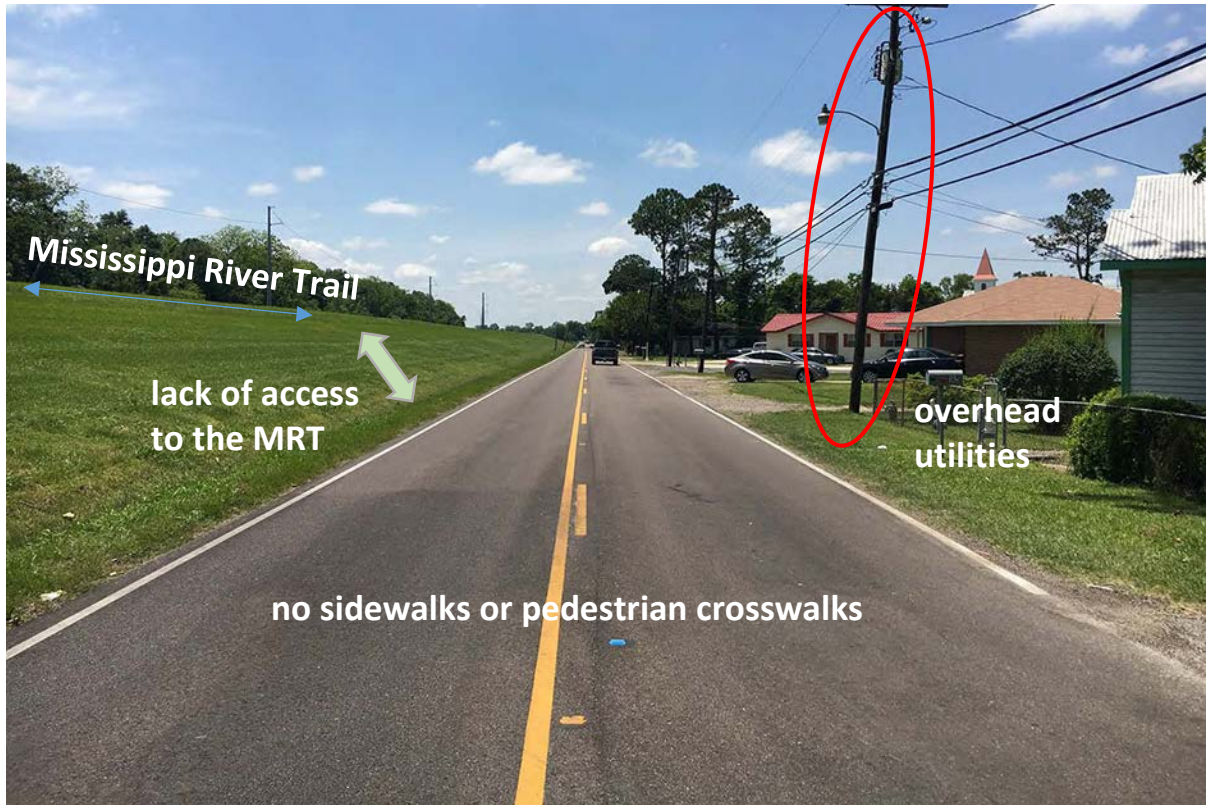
W. 2nd Street - overhead utilities, heavily travelled, visibility issues for intersecting streets
